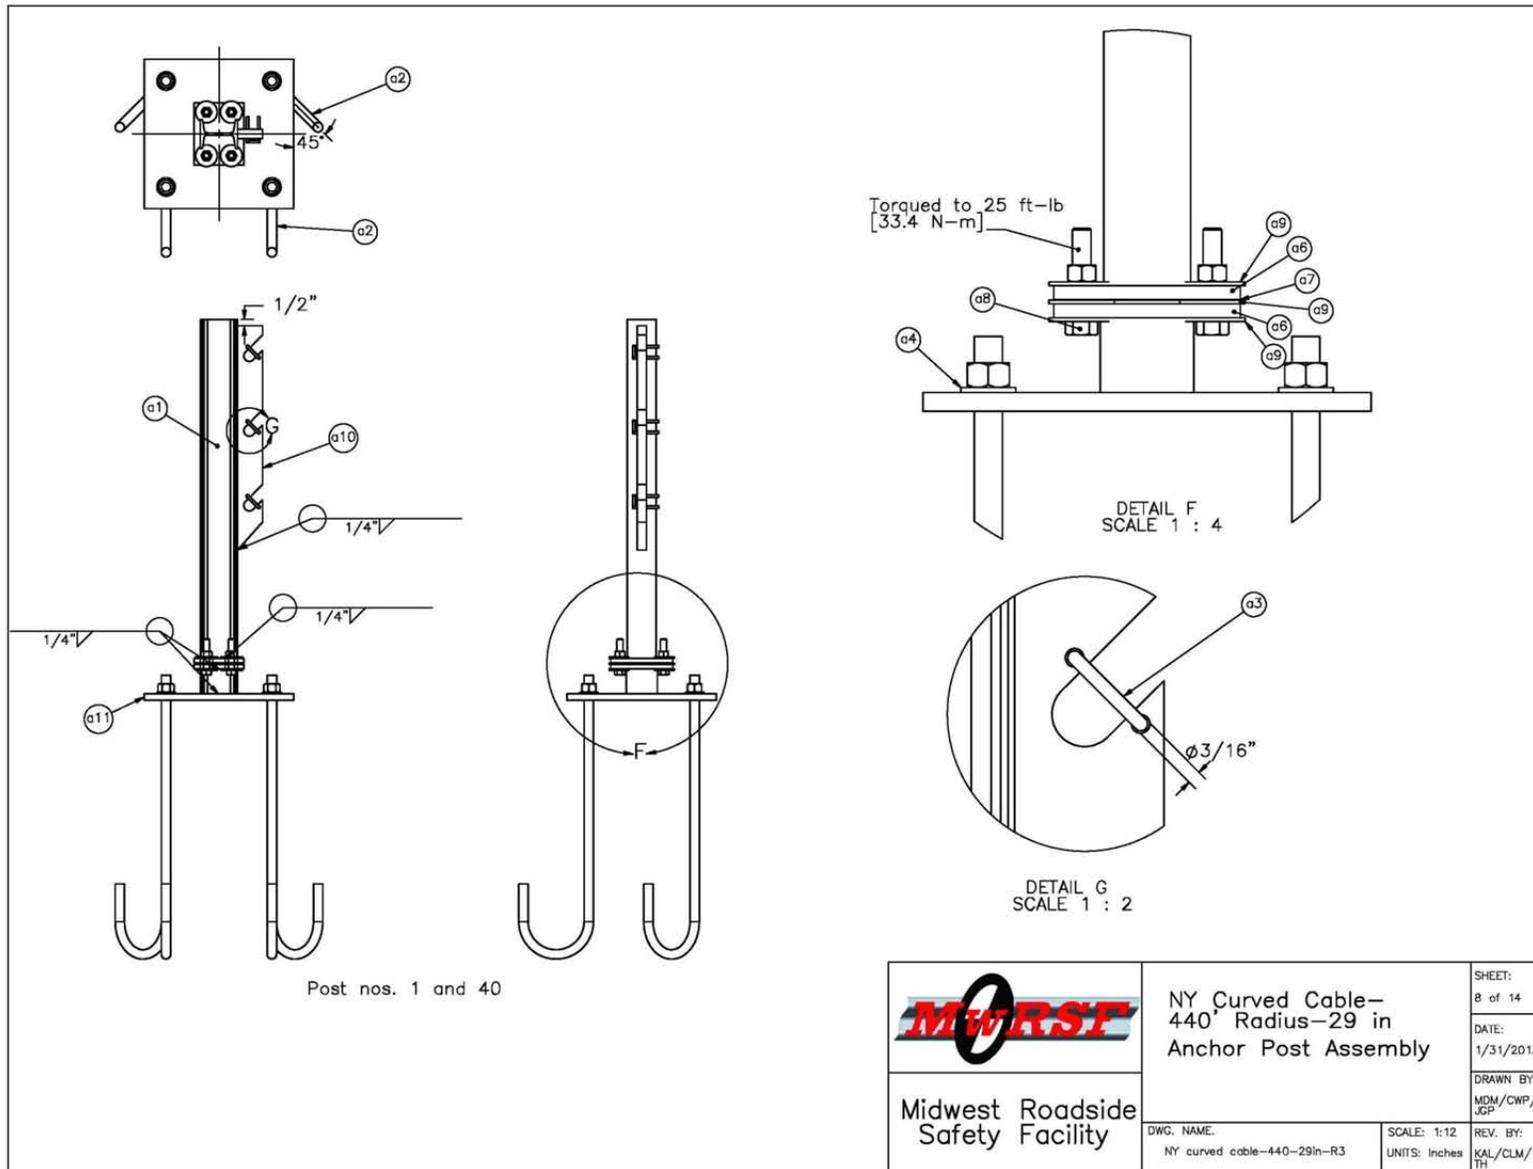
Anchor Post Assembly Details, Test No. NYCC-3
